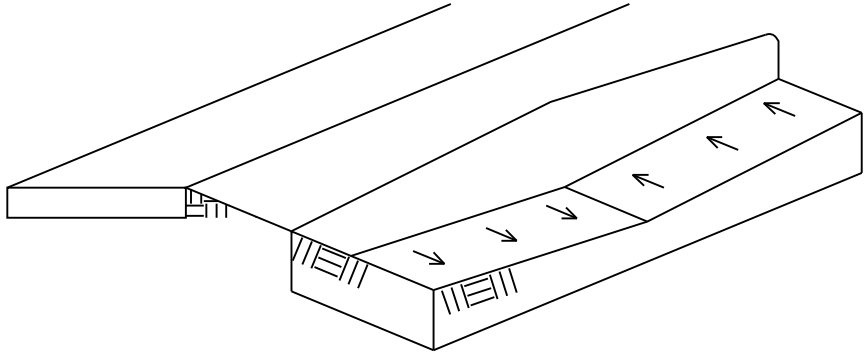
DETAIL OF SPECIAL INLET FOR COMBINATION CONCRETE CURB AND GUTTER (BARRIER CURB)
